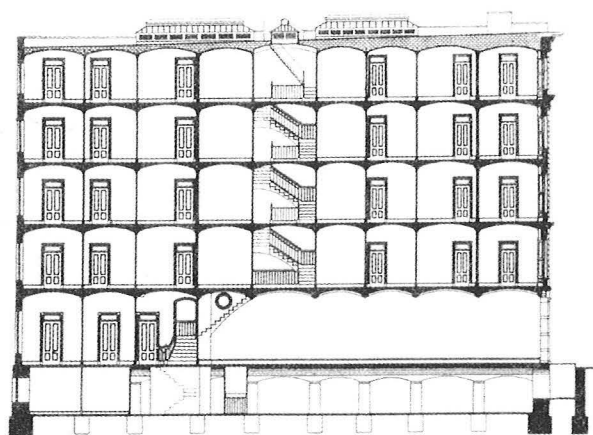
FIRE-PROOF TENEMENT HOUSE, NEW YORK CITY. LONGITUDINAL SECTION SHOWING TILE ARCH CEILINGS FROM CELLAR TO ROOF.
